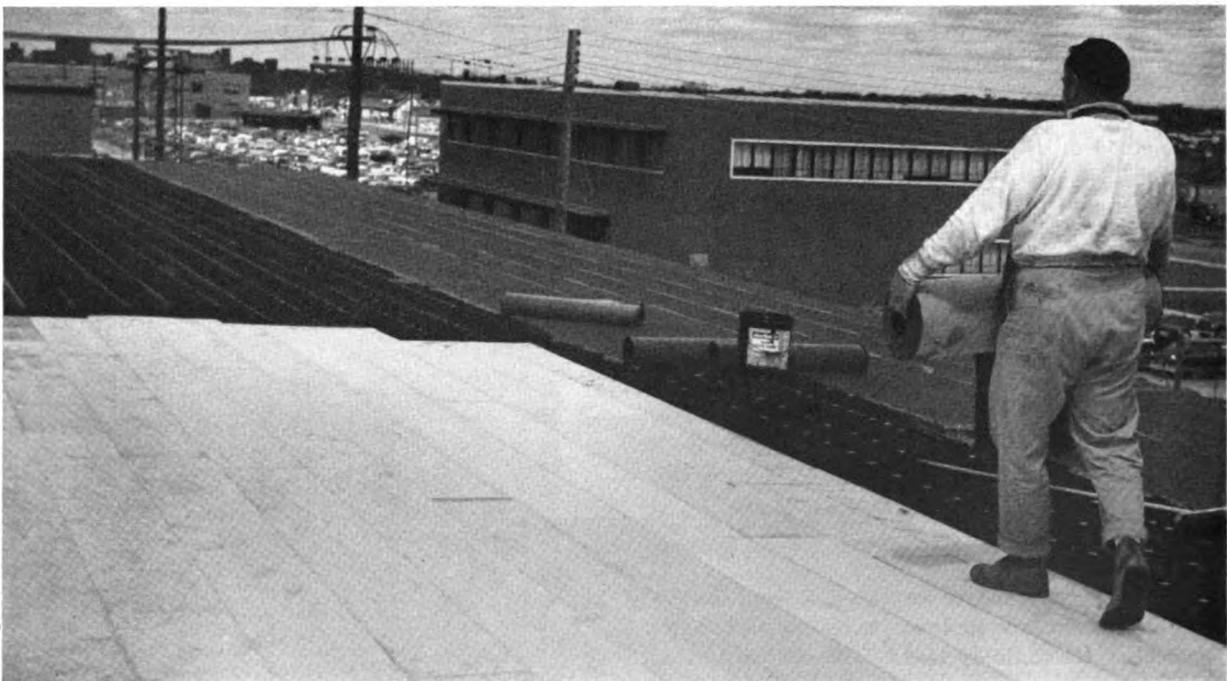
Expanded polystyrene boards on a roof installation
